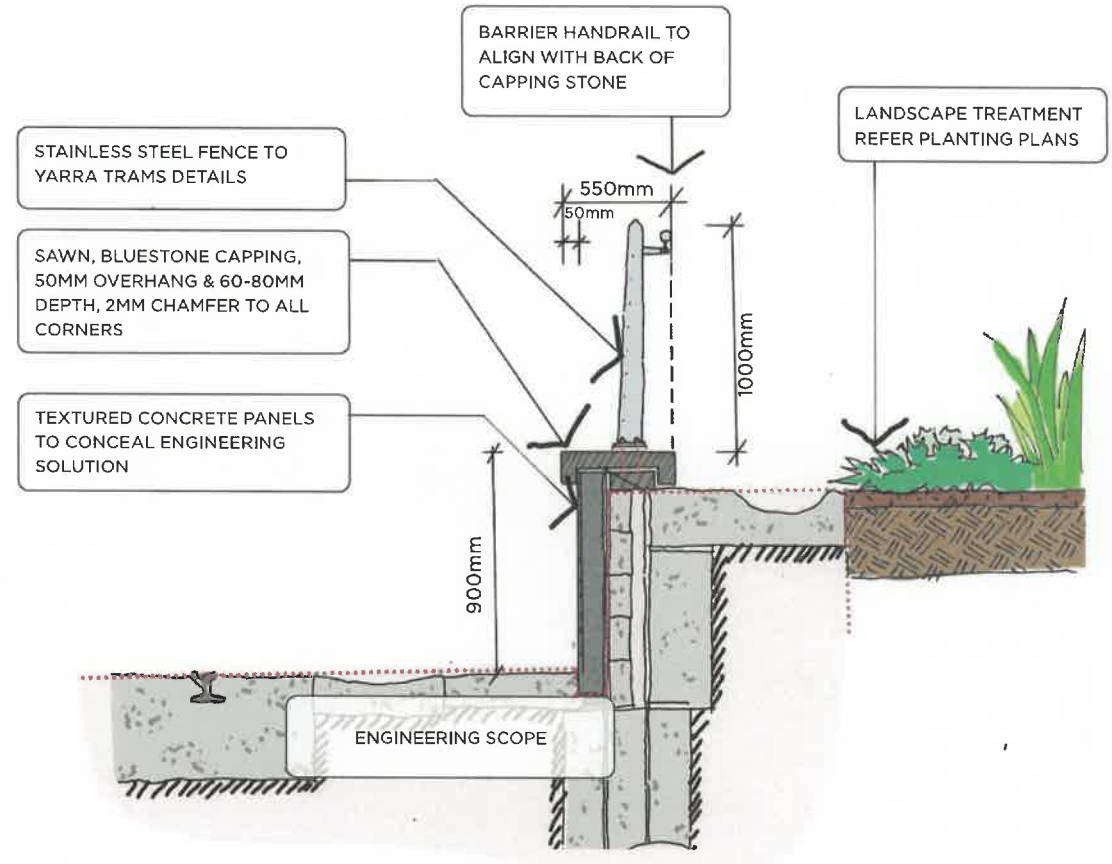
Typical retaining wall section (sketch detail - 1:2 @ A3)
